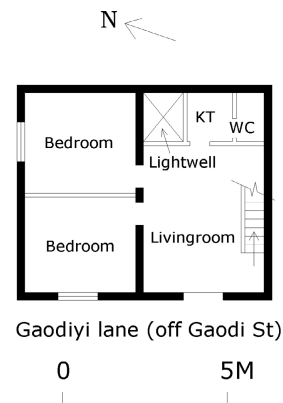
Floor plan of a single-storey *mingziwu* house. Based on author's field survey.
